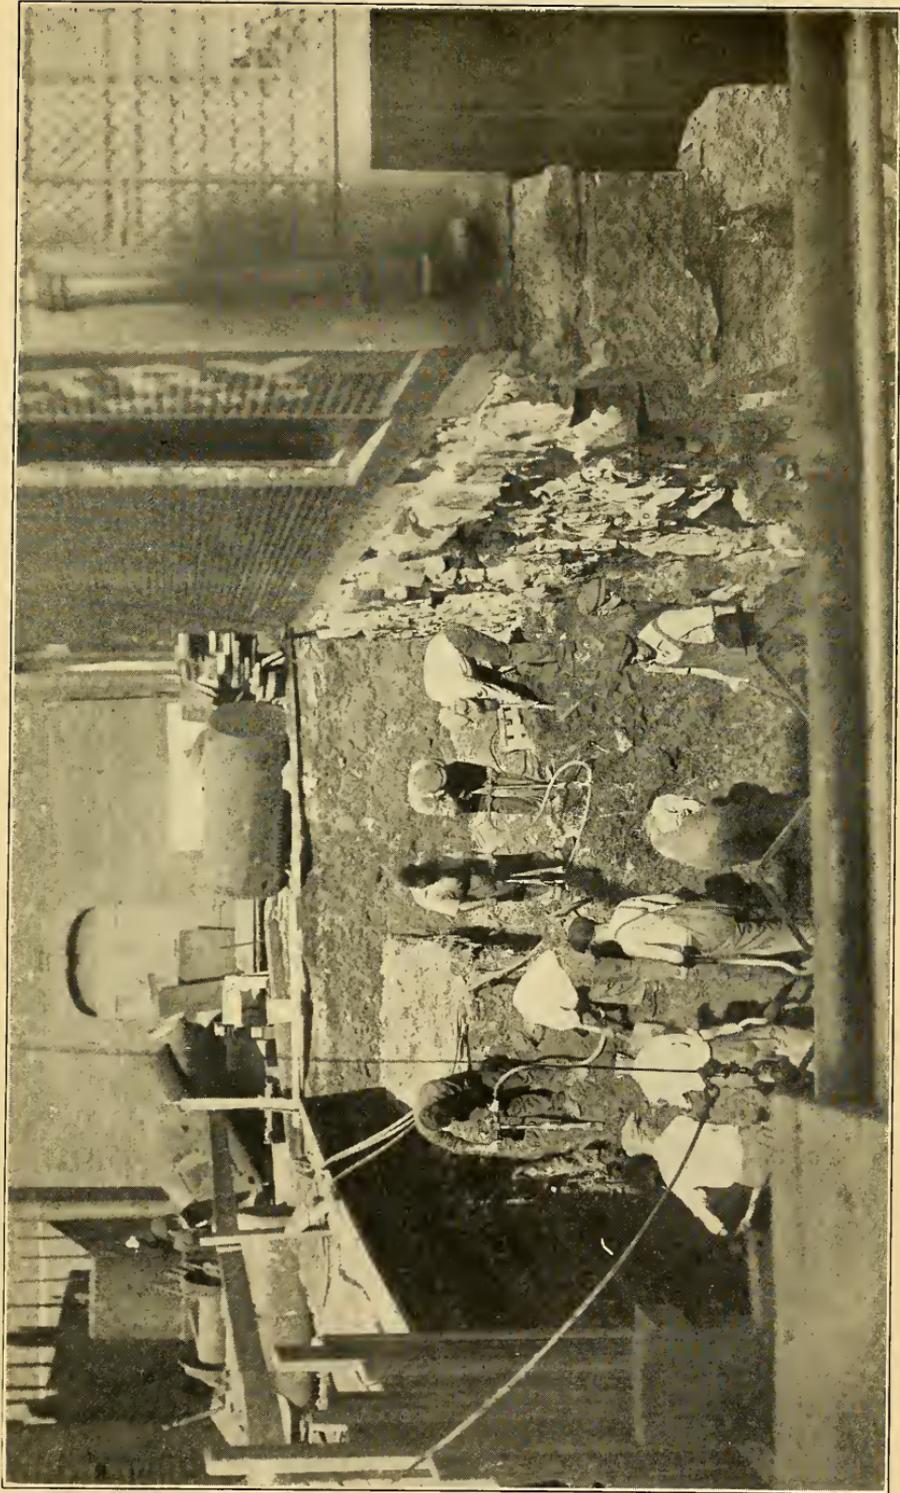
EXCAVATING WITH PNEUMATIC CLAY DIGGERS — LEWIS STREET
